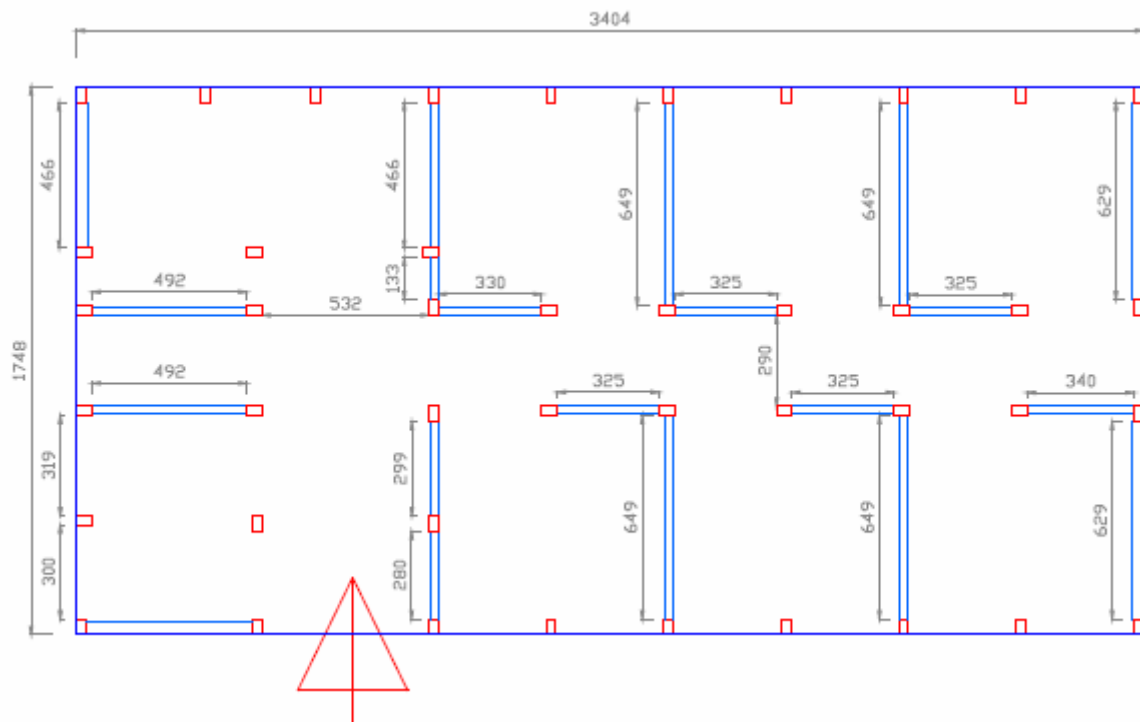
Typical school plan without shear walls. All the walls shown in the drawing refer to those occupying a full span. Walls with openings are excluded. All the columns have dimensions of 0.3m x 0.5m. The arrow indicates the entrance to the building. Dimensions are in cm.
